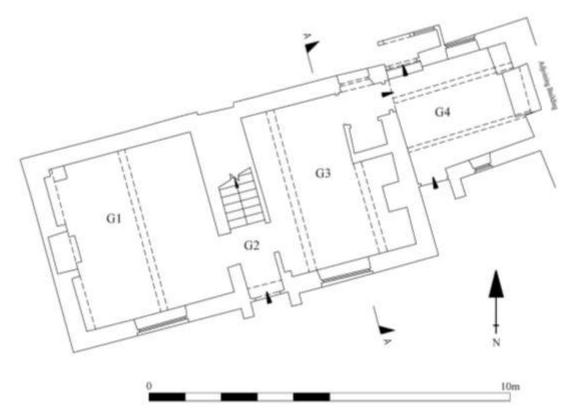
Ground-floor plan Modified from client's plans. Room numbers allocated for this survey only
